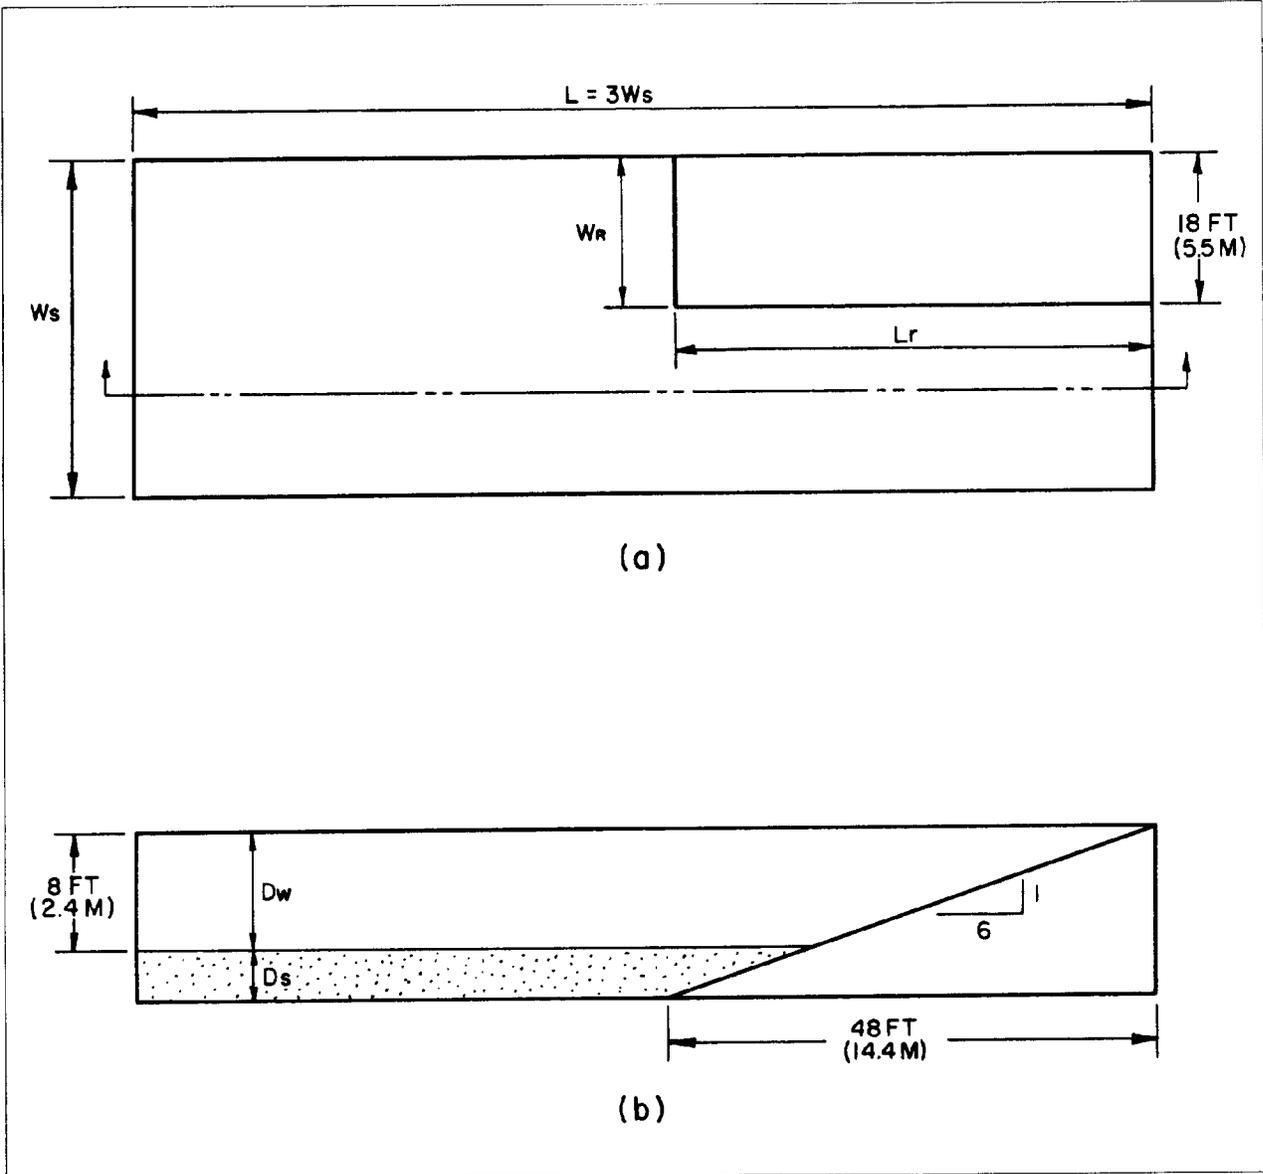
Water volume configuration: (a) plan view and (b) cross section.
